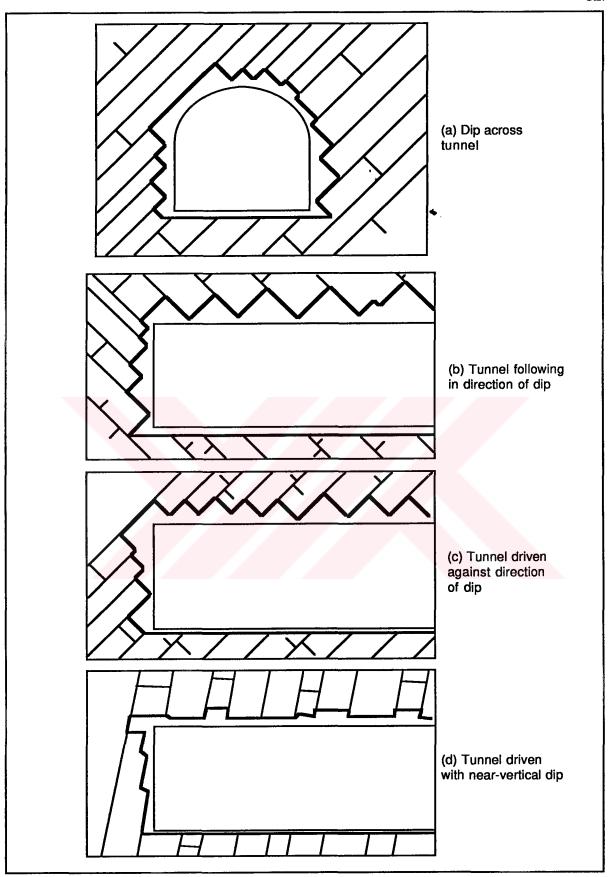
DIP STRATA IN RELATION TO TUNNEL EXCAVATION
